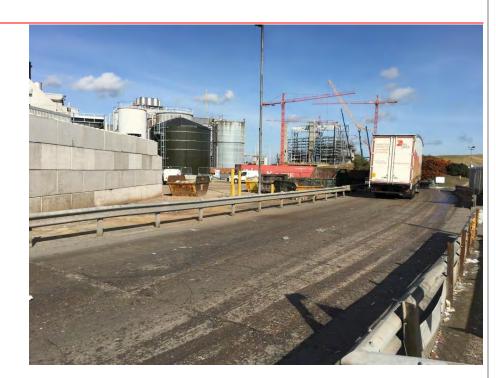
View of the new WTP construction towards the eastern boundary of the Proposed Development site (facing east).
